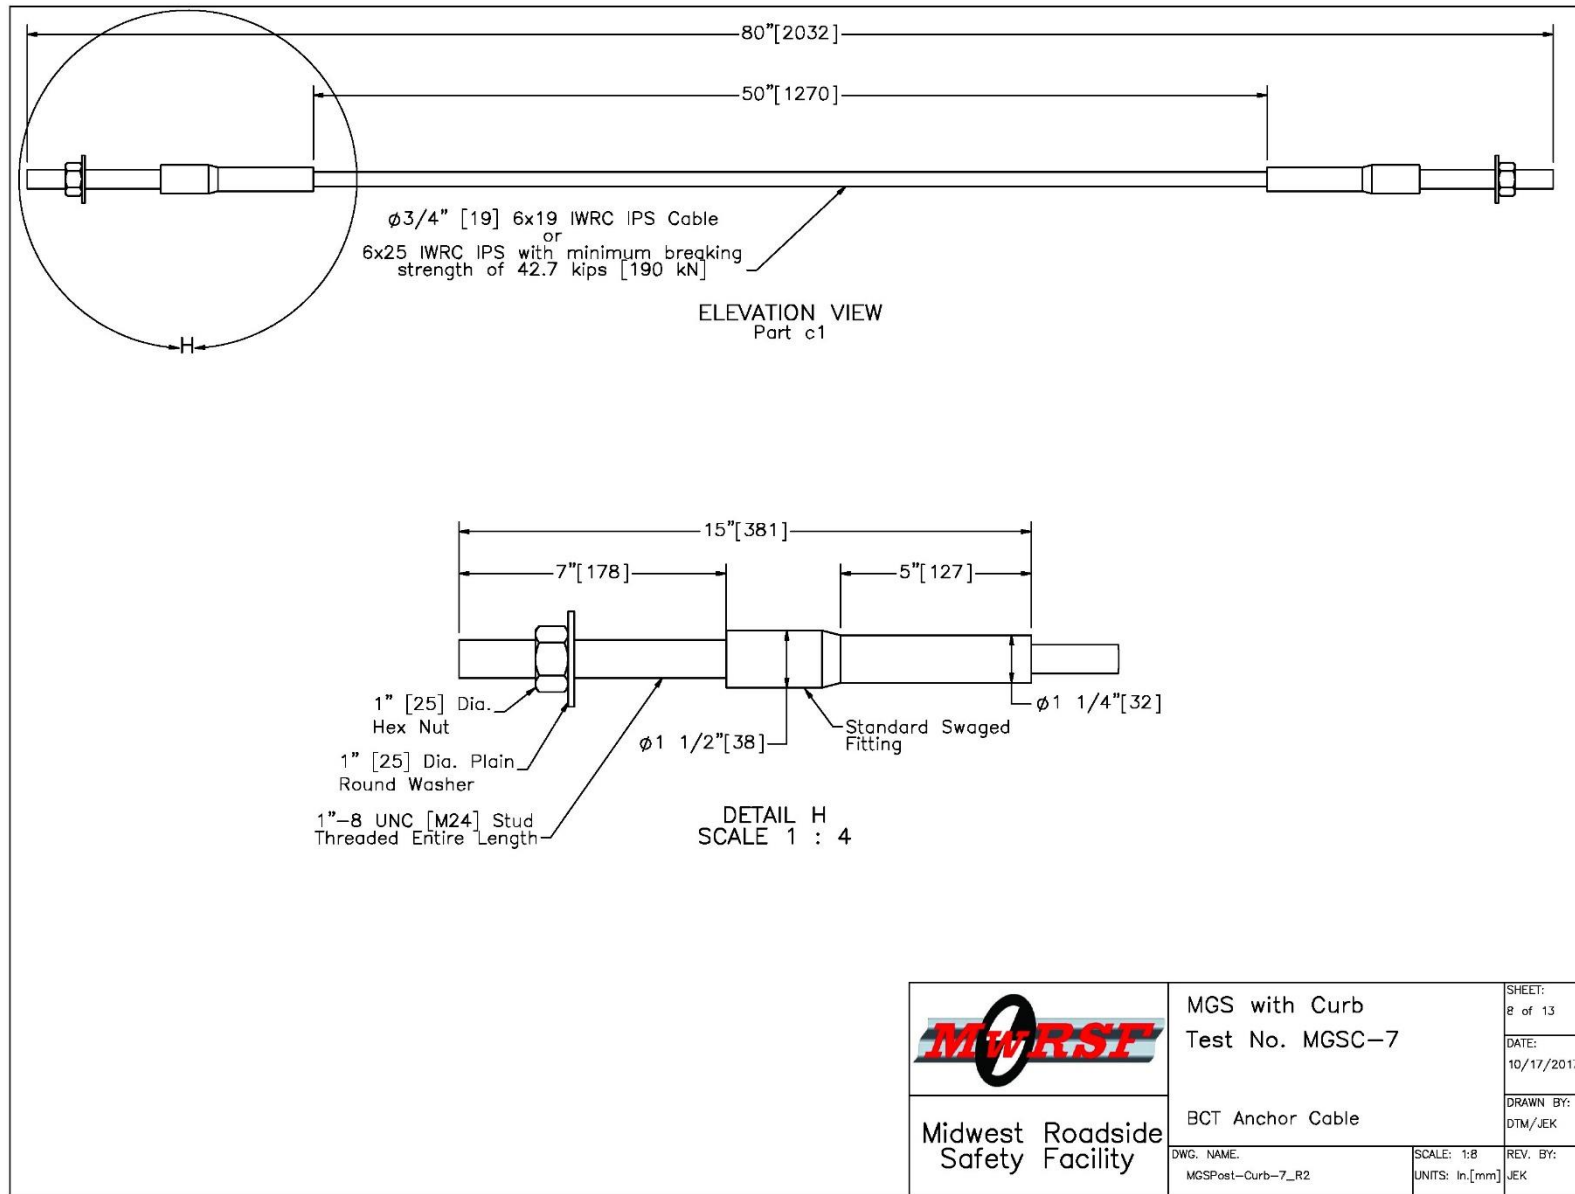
BCT Anchor Cable, Test No. MGSC-7
